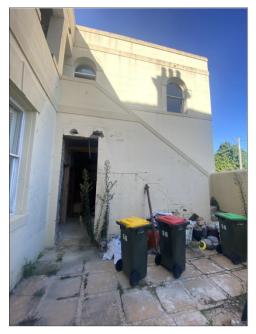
The western arm of the rear wing including the external stair were added as part of the 1990s works. A new opening has been recently made at ground floor level.
